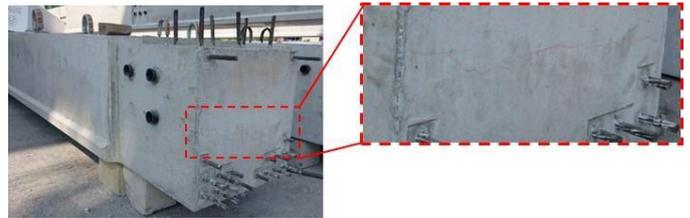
Horizontal cracks at the end of Pretensioned PC hollow girder.
